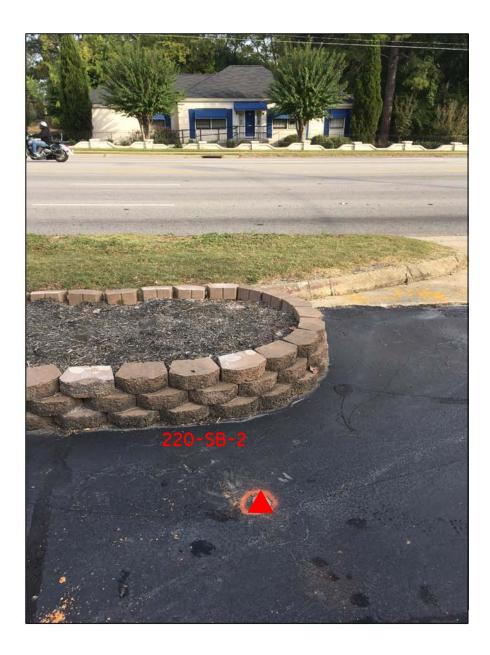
VIEW OF SOIL BORING LOOKING NORTH PHOTO 4 - VIEW OF SOIL BORING LOOKING WEST
